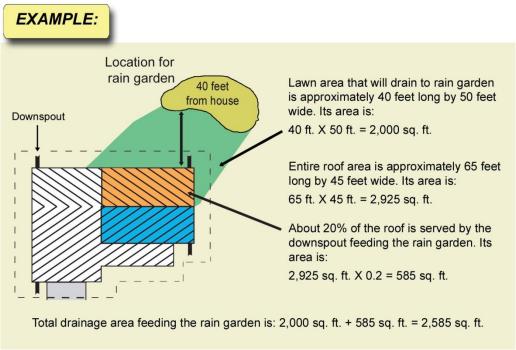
Calculating how large an area will drain into your rain garden. In this example, the garden is placed 40 feet from the house and has a large area of lawn draining into the garden. Both the roof drainage area and the lawn drainage area are added to find the total drainage area. If your garden will be placed 10 – 30 feet from the downspout, you need only calculate the roof drainage area. Source: University of Wisconsin.
